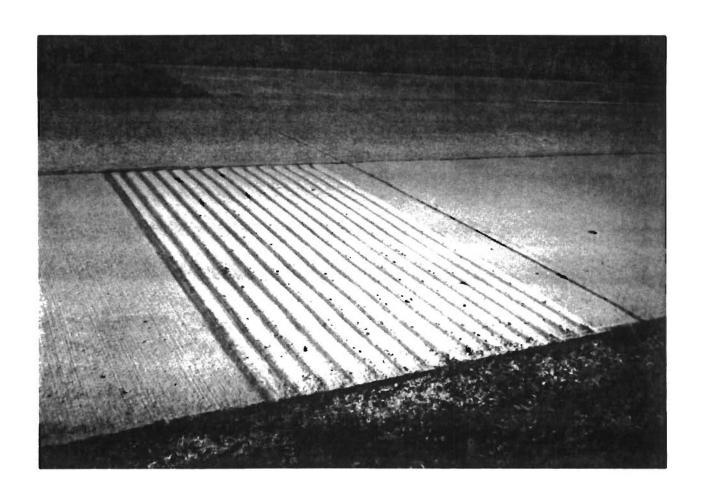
Example of concrete corrugated panels (full shoulder width).
